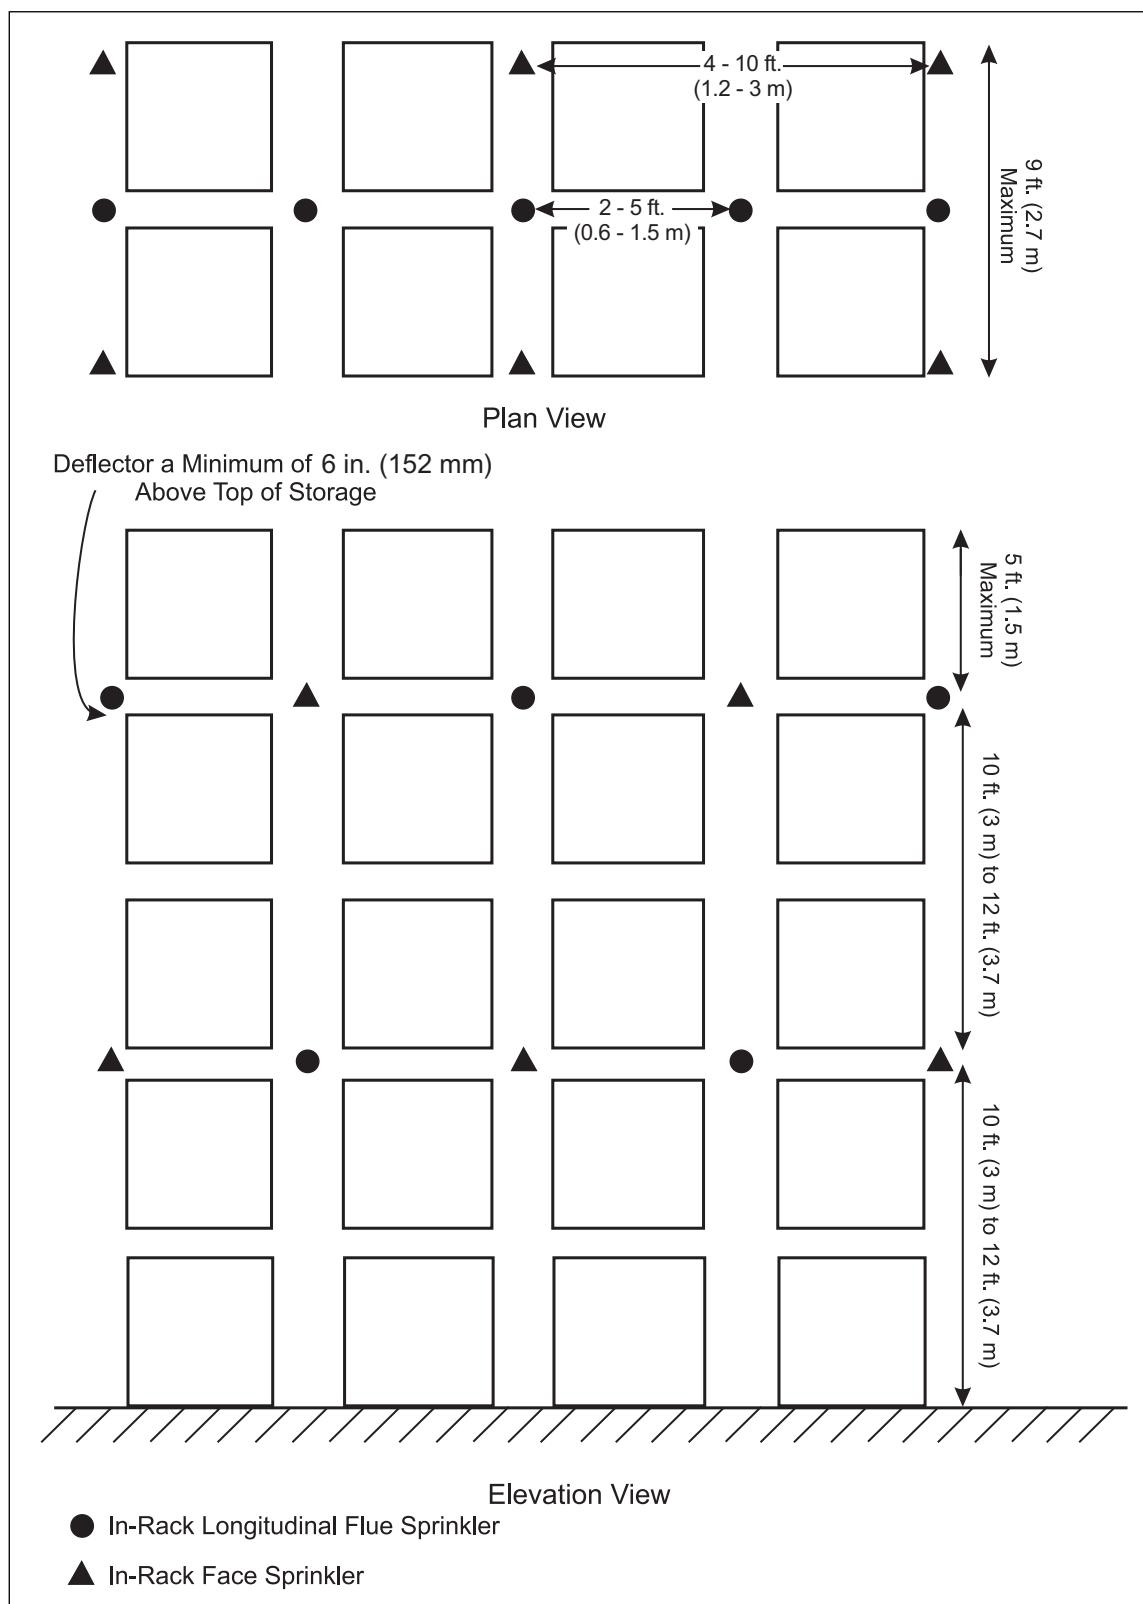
Double-row rack sprinkler layout: fire protection scheme B
